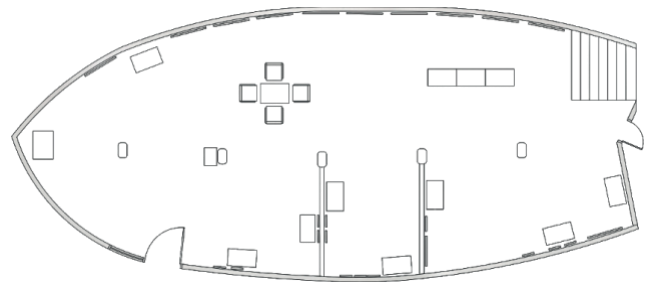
Affandi's 2nd Gallery Interior and Floor Plan
